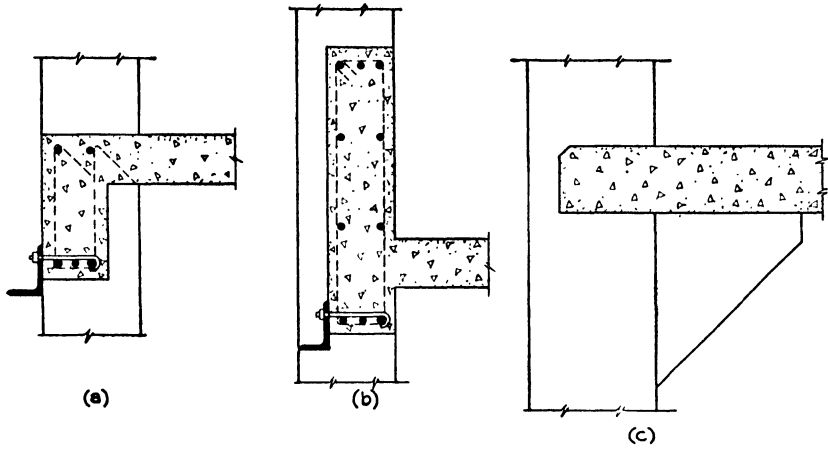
Concrete Frame Spandrels. (a) turn-down beam; (b) turn-up beam; (c) flat slab support.
